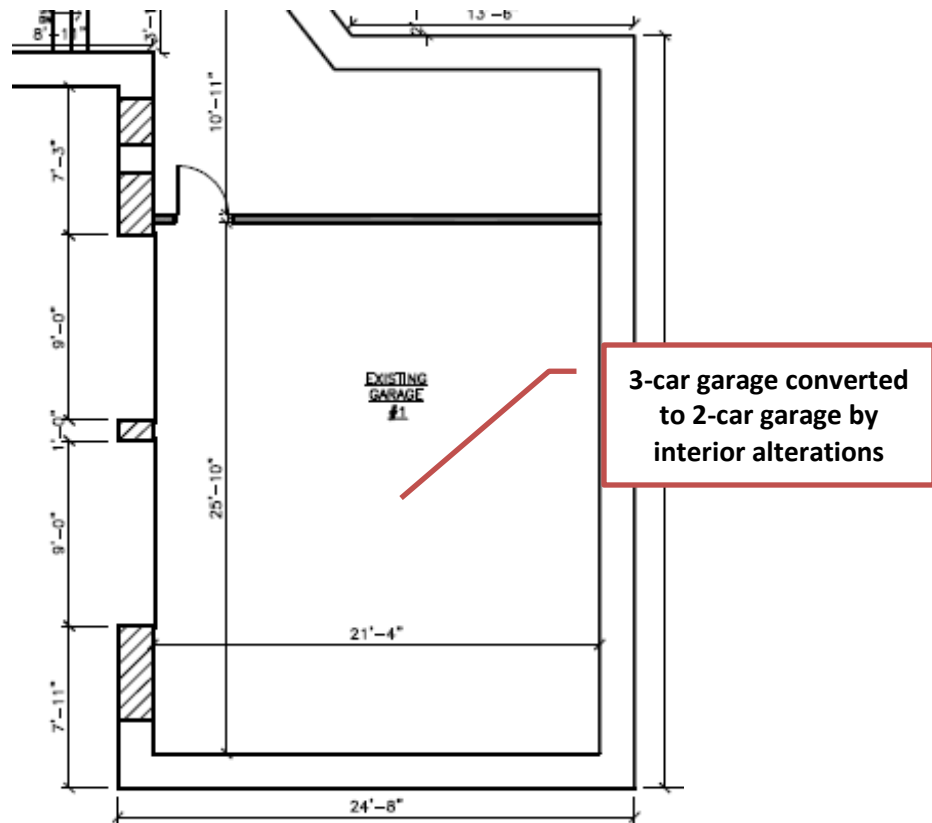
Excerpt of Previous Lower Level Plan – Existing Garage
